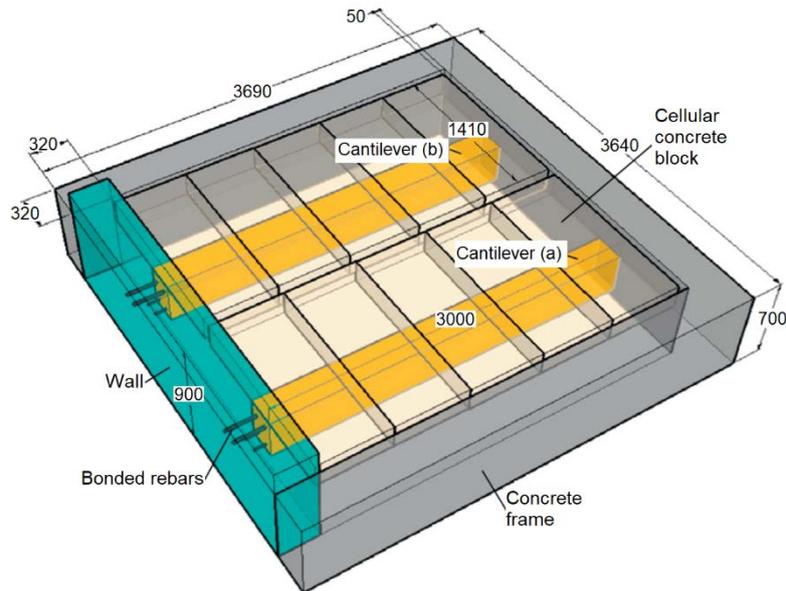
Beam-wall connection configuration tested under fire [11] (All dimensions in mm)
